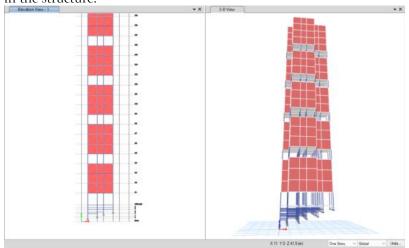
Elevation & 3D view of the building without bracings on 15° sloping ground
